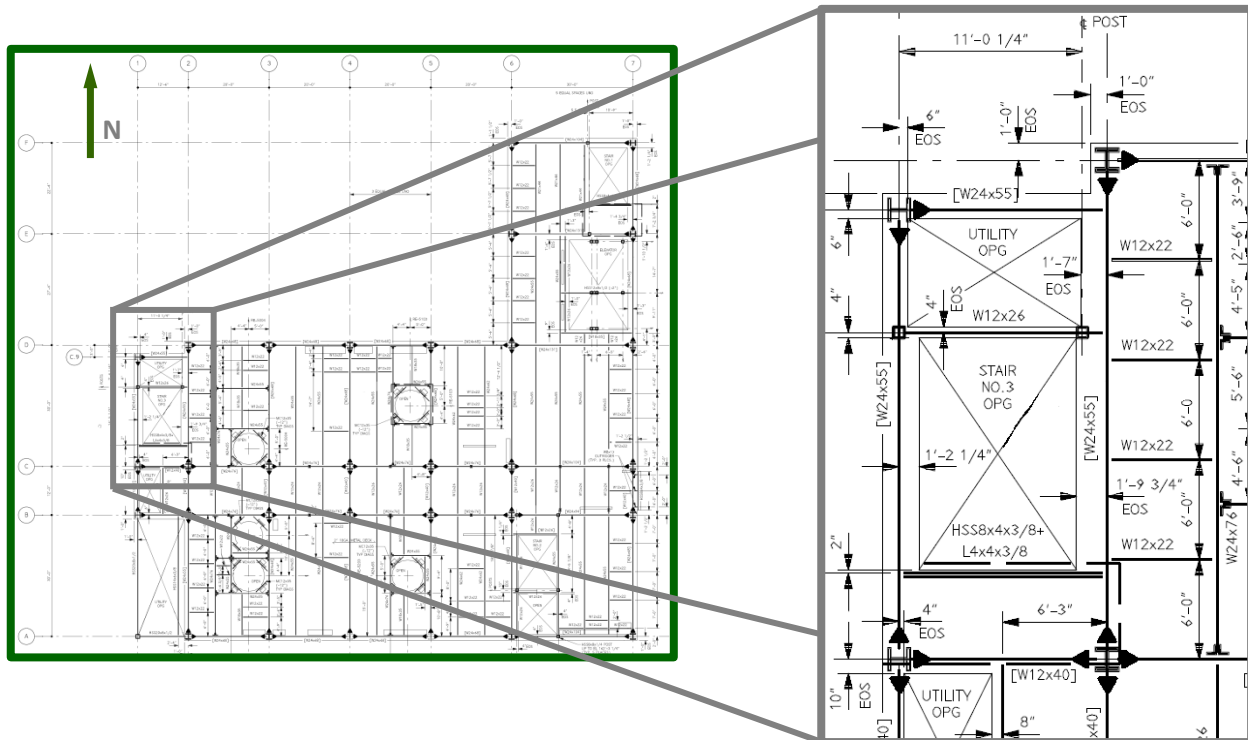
Courtesy of Project Engineer. The third floor framing plan showing the odd column rotation on the west end of the building.
